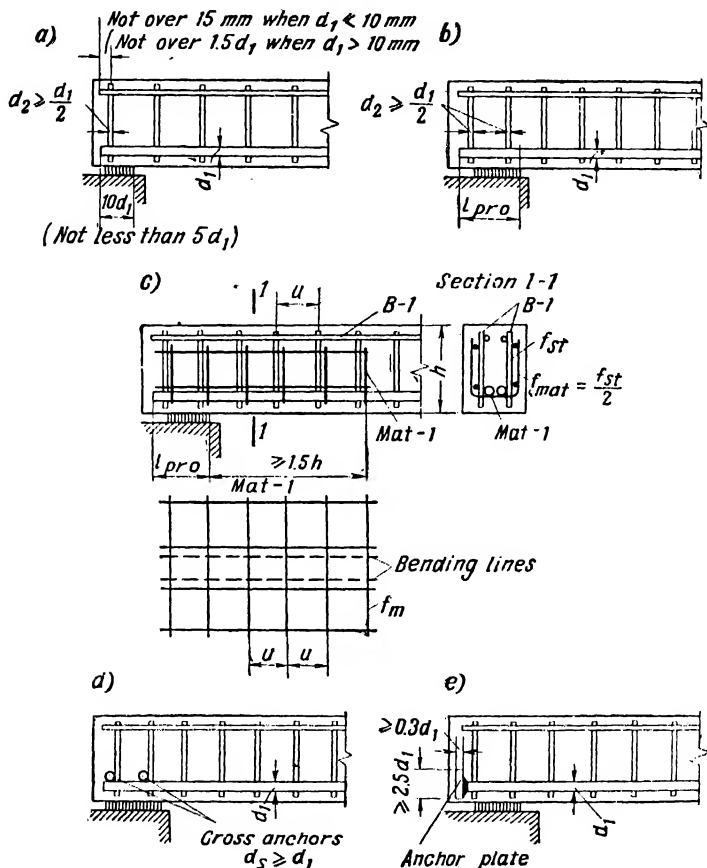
Anchoring longitudinal bars of blocks at free-end beam supports
